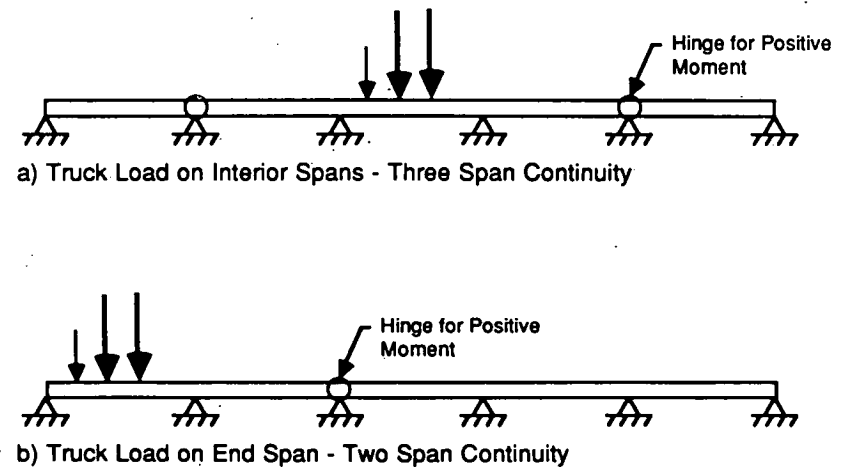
Bridge Continuity Without Positive Moment Reinforcement for AASHTO Truck Loading
